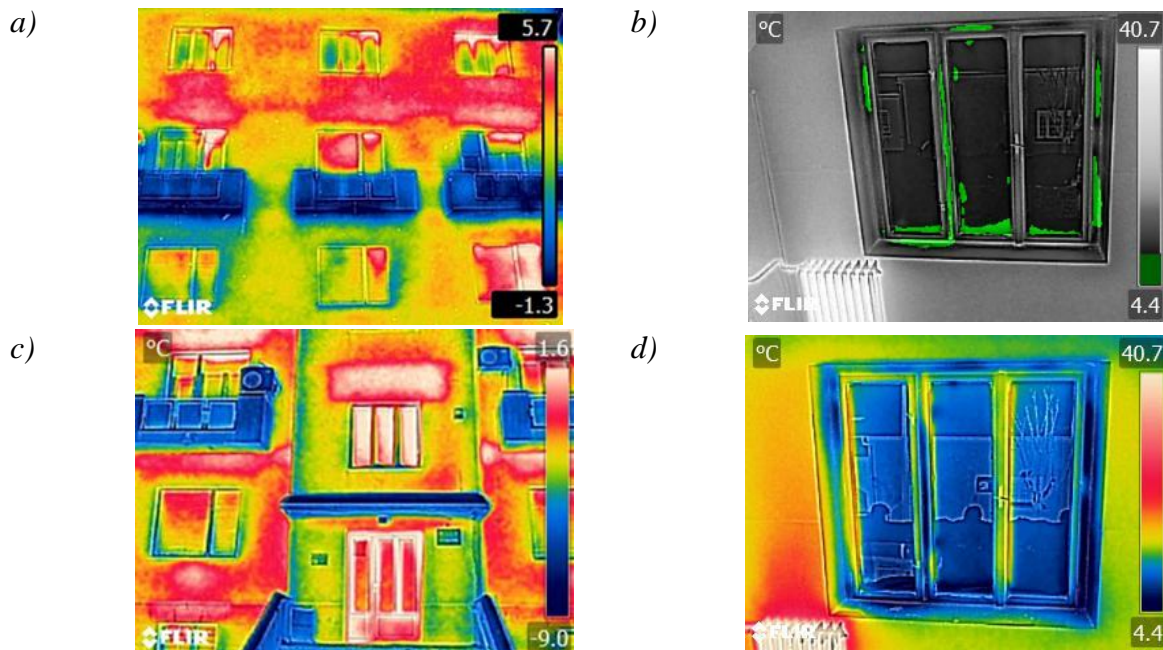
Thermal image: a) East-facade of mining department building; b) three-wing single glass window; c) front facade of mining department building with windows; d) three-wing single glass window
